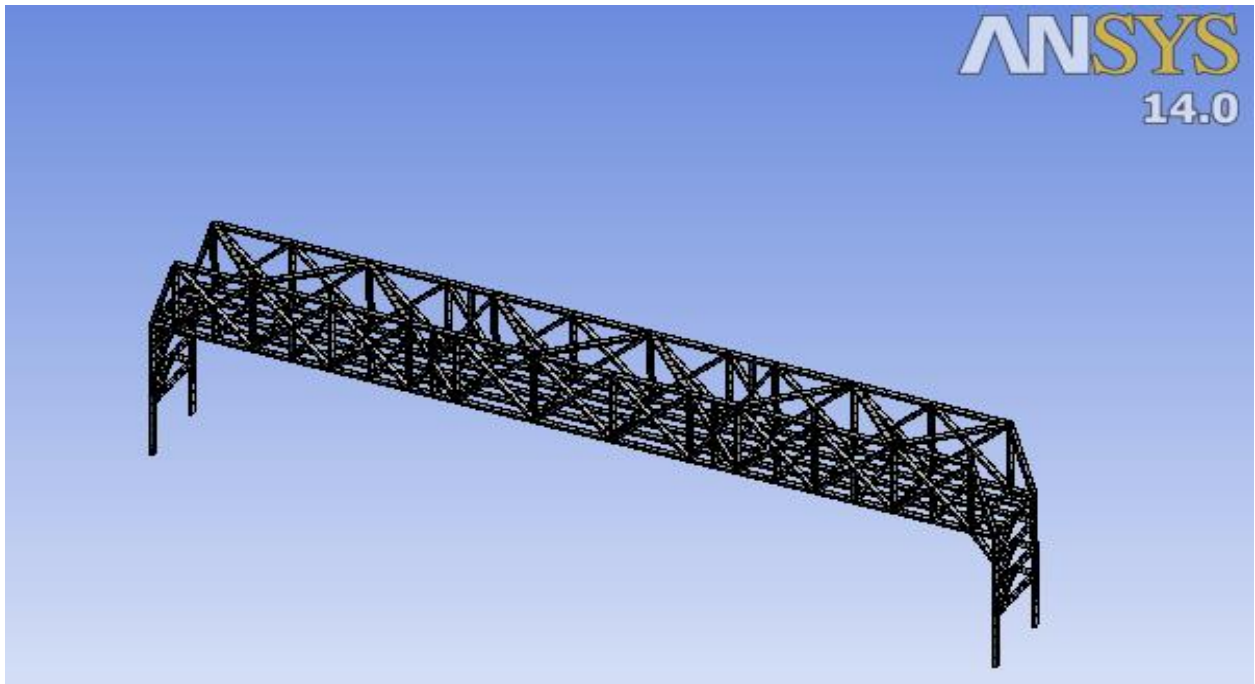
Meshing of the steel truss pedestrian bridge in workbench software
